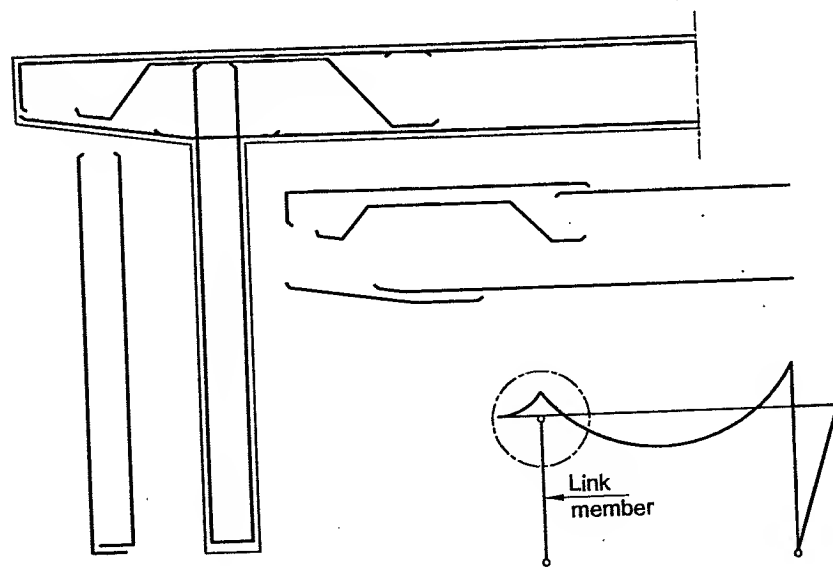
Detailing of Frame Joints (Detail-2)
